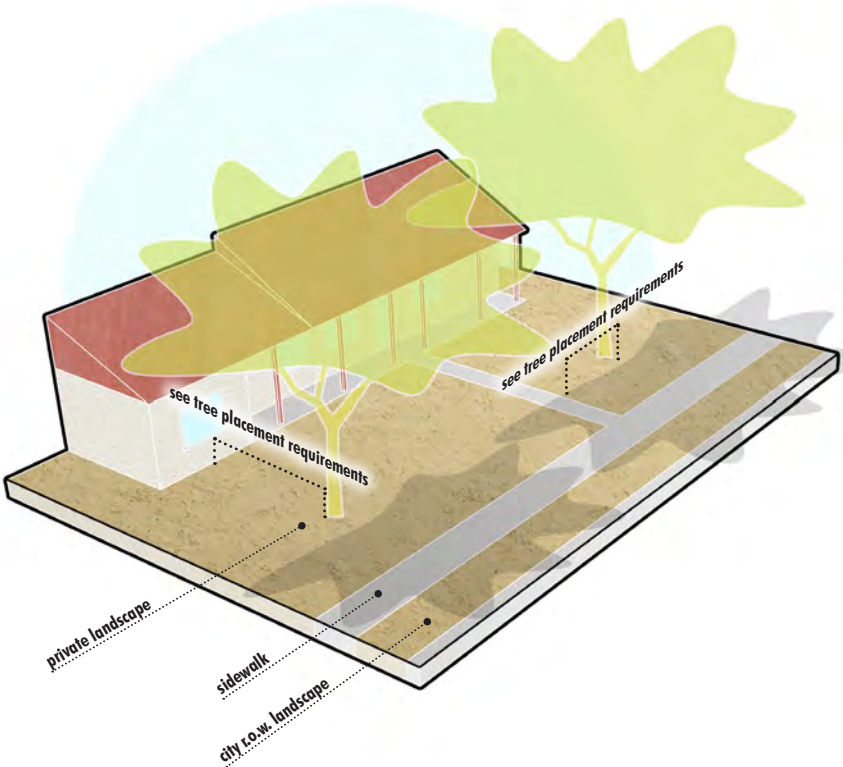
TOOLBOX- RESIDENTIAL AND BUILDING PLACEMENT
